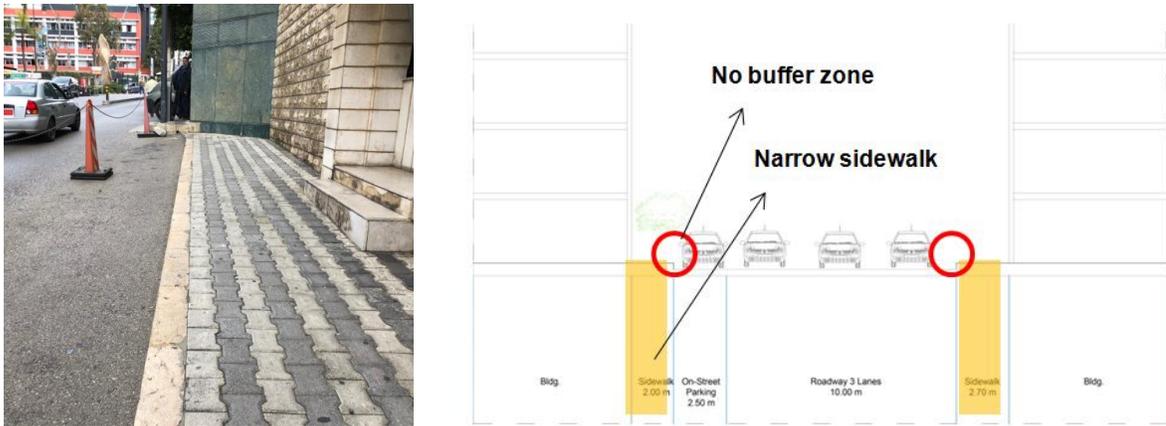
Narrow Sidewalks at some sections of Verdun Street (Author 2019)
